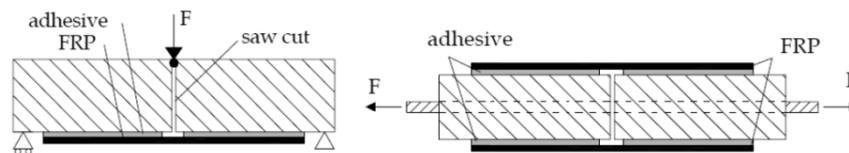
Typical test set-up in small scale specimens (Klamer et al. (2008)): (Left) Three point bending test; (Right) Double-lap shear test.
